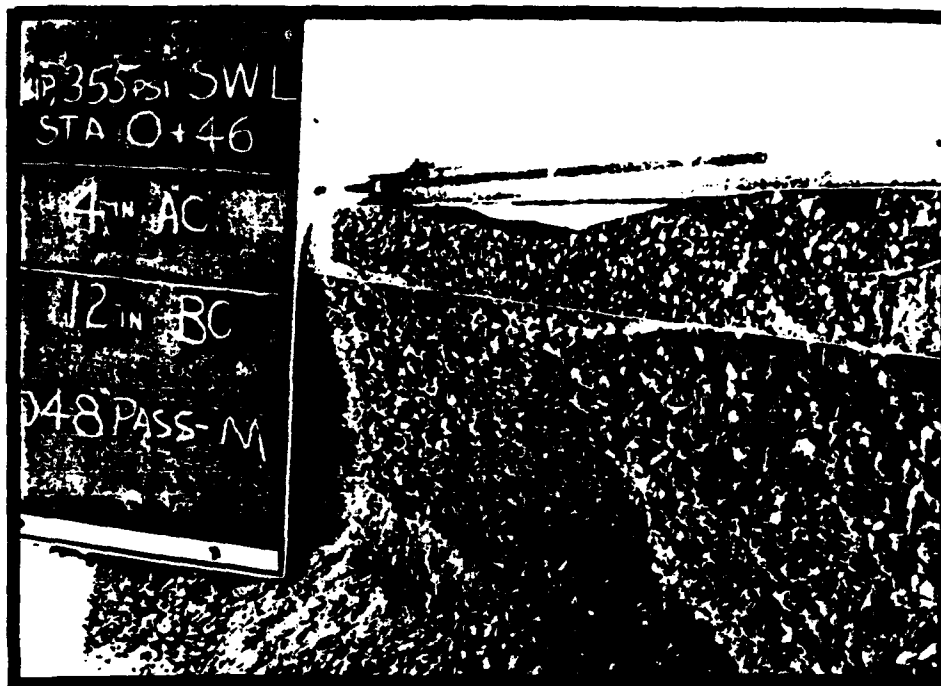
Trench Side View in the Marshall 4-inch Flexible Test Section.
